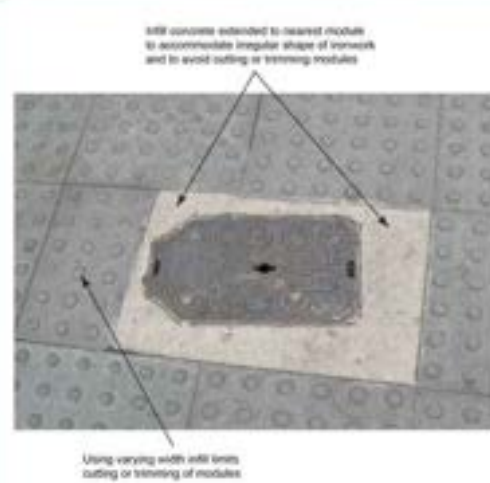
Extension of infill concrete - modules up to 305 mm
